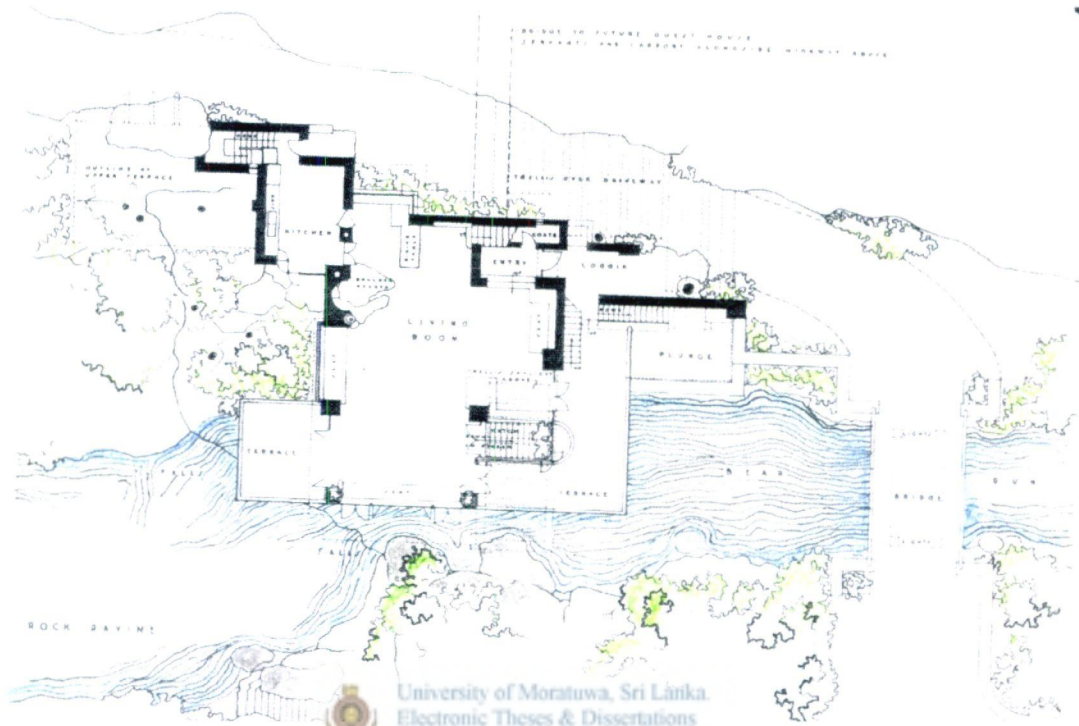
Ground floor plan - falling waters by frank Lyoid Wright
